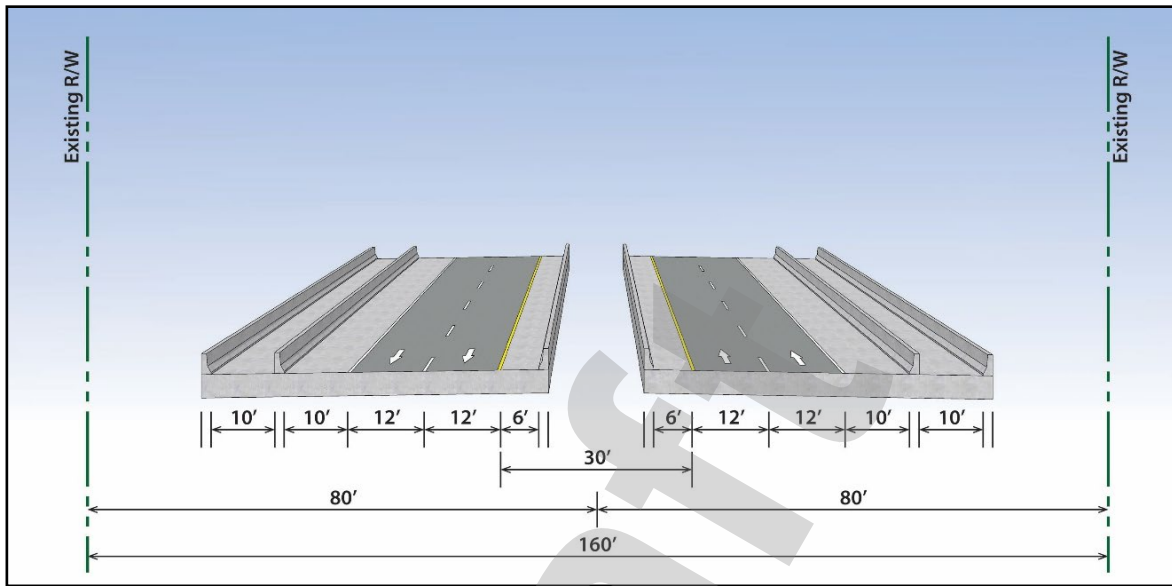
Proposed Bridge Typical Section – Old Lakeland Highway / CSX Railroad
